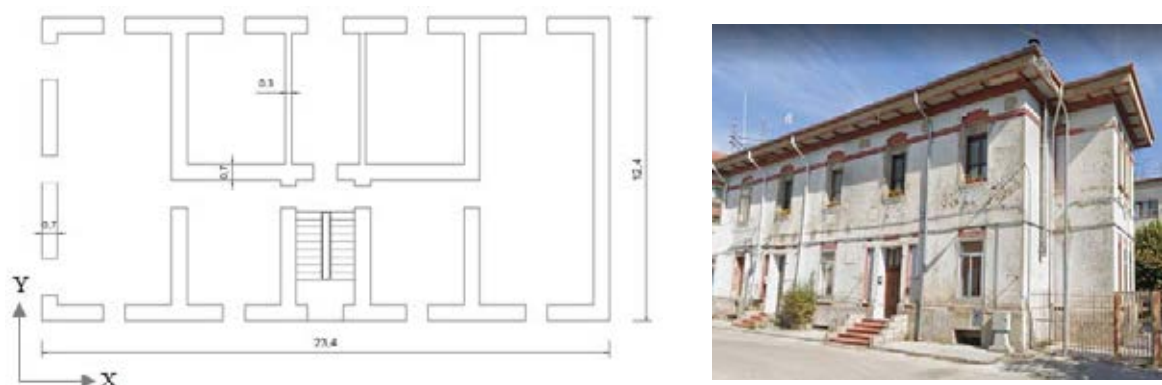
MUR3,Lr,Reg,C building typology: plan geometry of the first story (left) and a picture (right).
